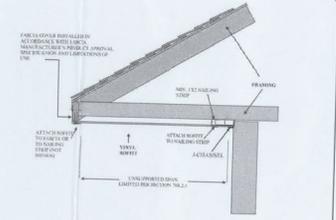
TYPICAL SINGLE-SPAN VINYL SOFFIT PANEL SUPPORT
